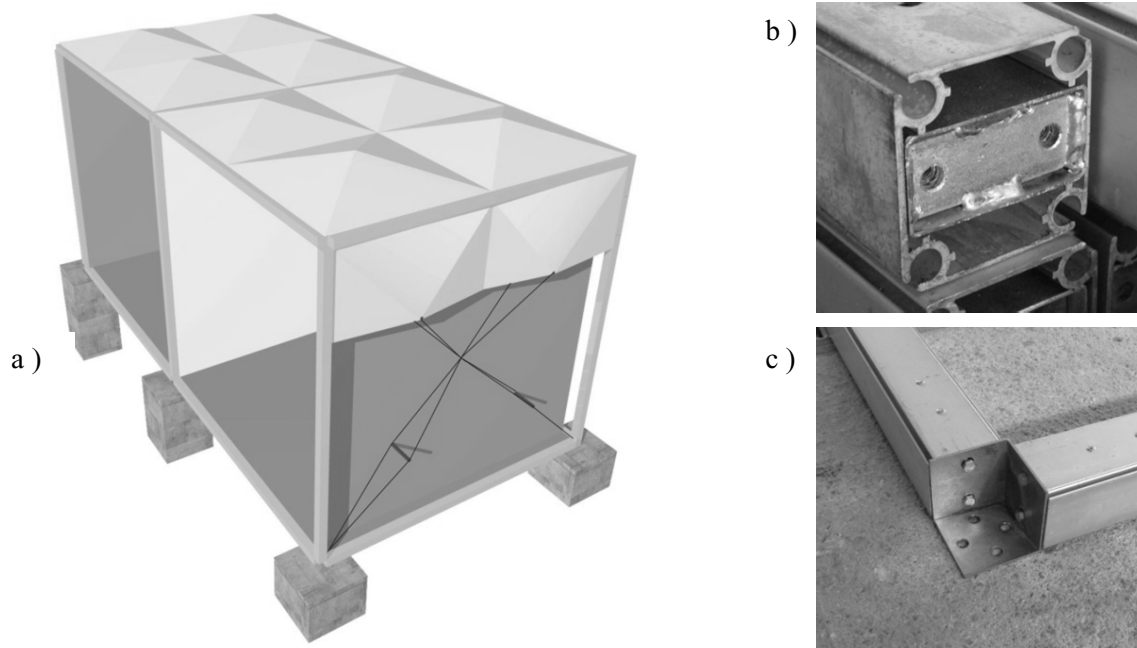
a) overall view of test cell facility (Drawing by Alex Davico), b) aluminium frame profile section, c) steel joint connection on corners.
